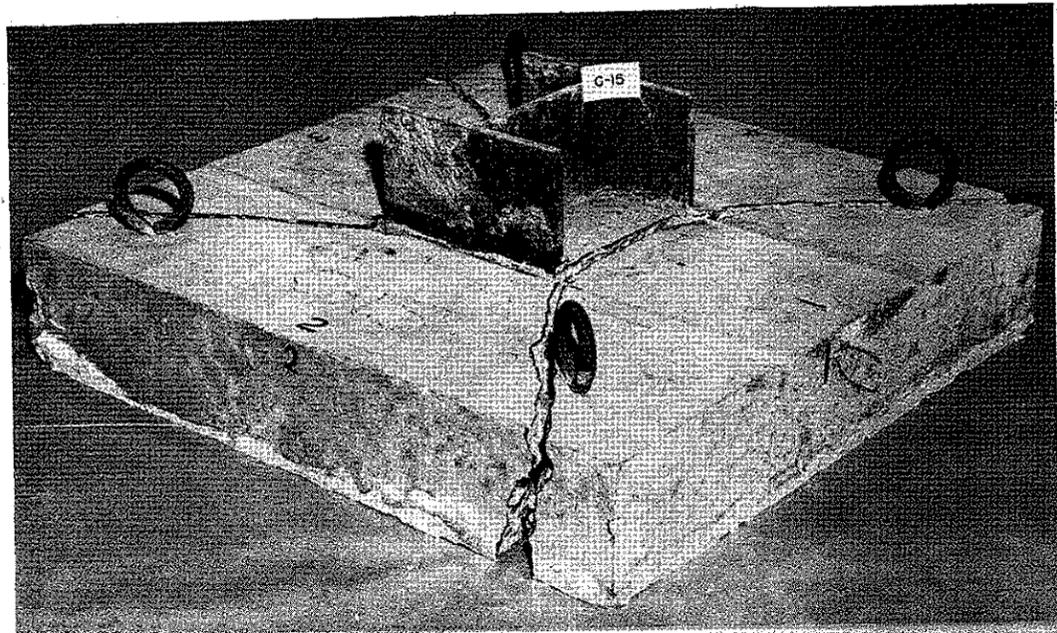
APPEARANCE OF SPECIMEN C-15 AFTER TESTING.
